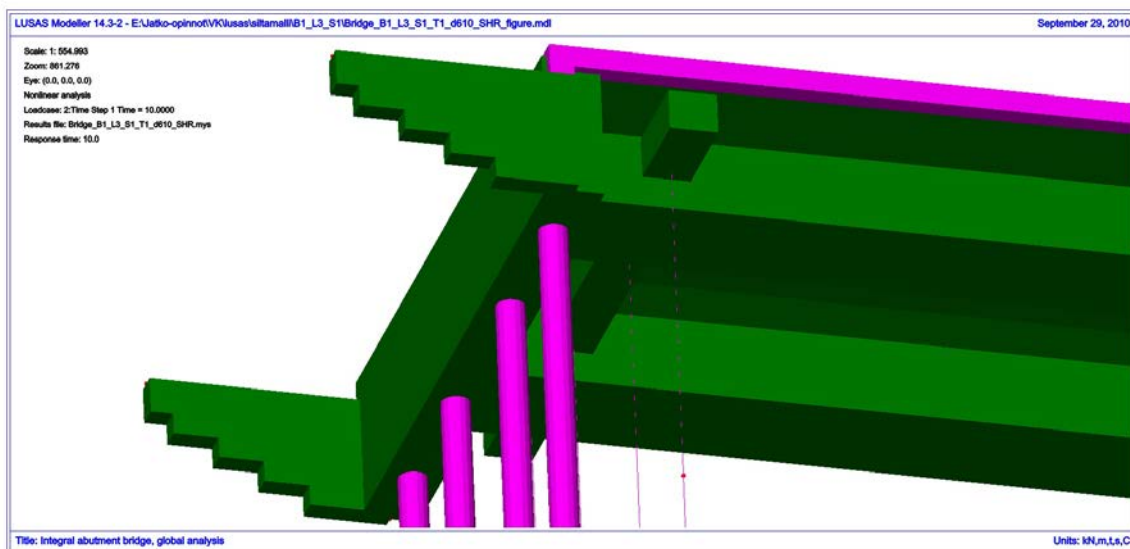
Abutment pile and structure orientation in model B1_L3_S1_T1_d610.
